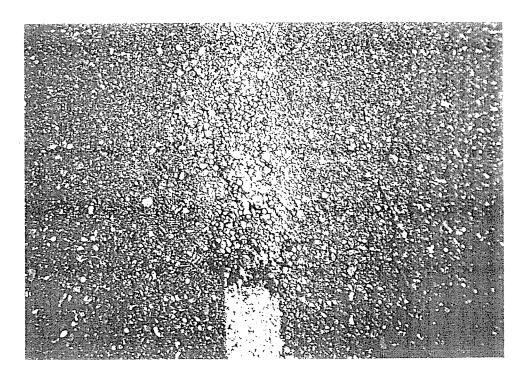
Paint Stripe Removal Using the Vacuum Blast Method
